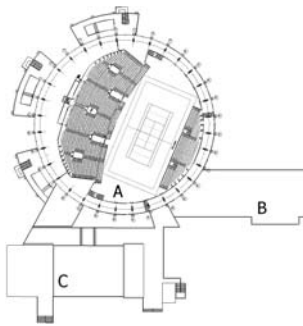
A plan of the ground floor of the Urania. Drawing: B. DEJA
